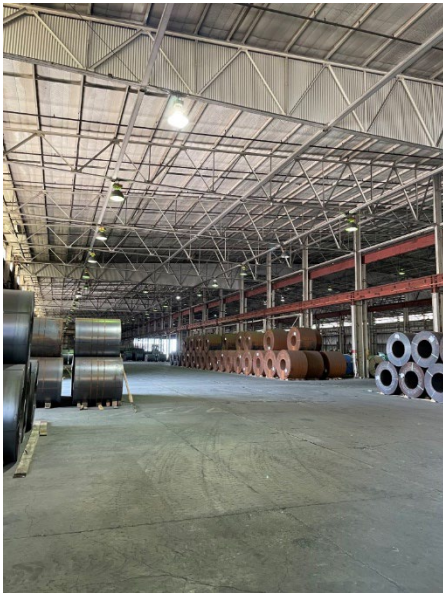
Interior asphalt floor in the warehouse have settled and have cracking throughout.
